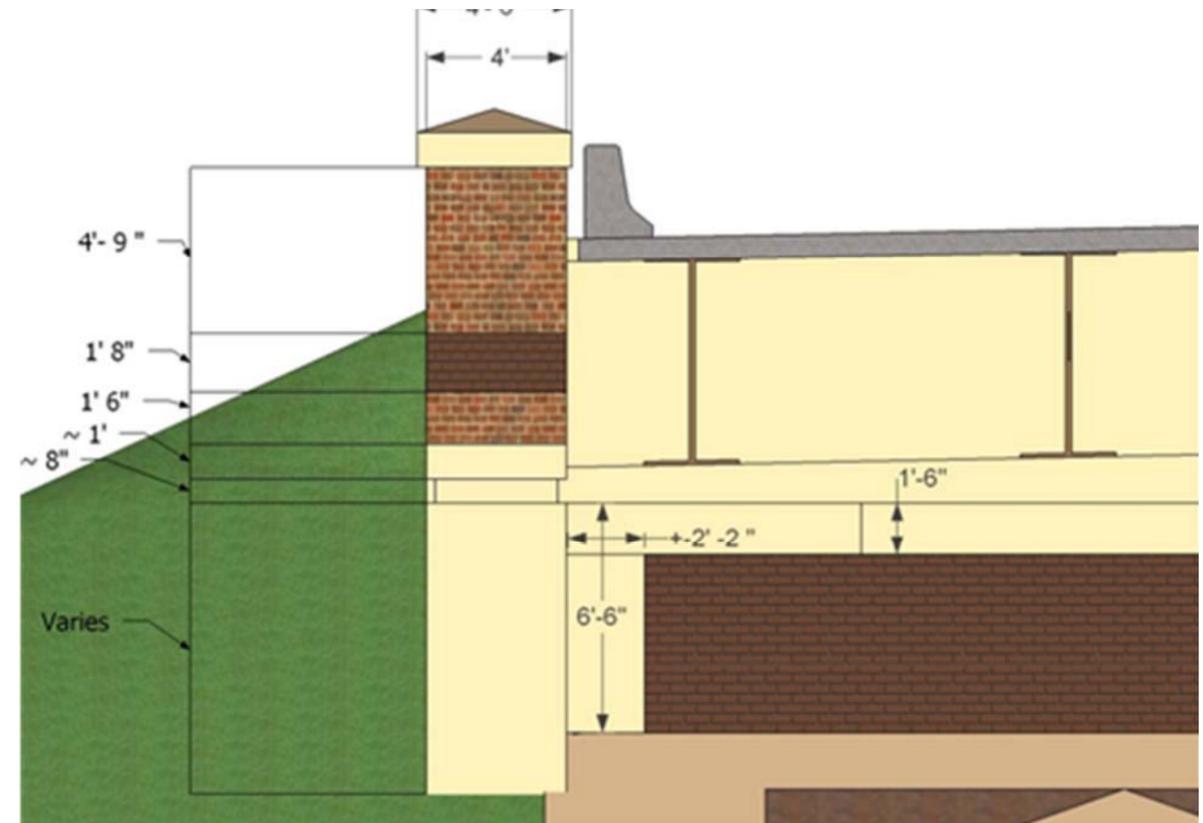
Partial Elevation View – Monumental Wingwall with Accent Brick Band
